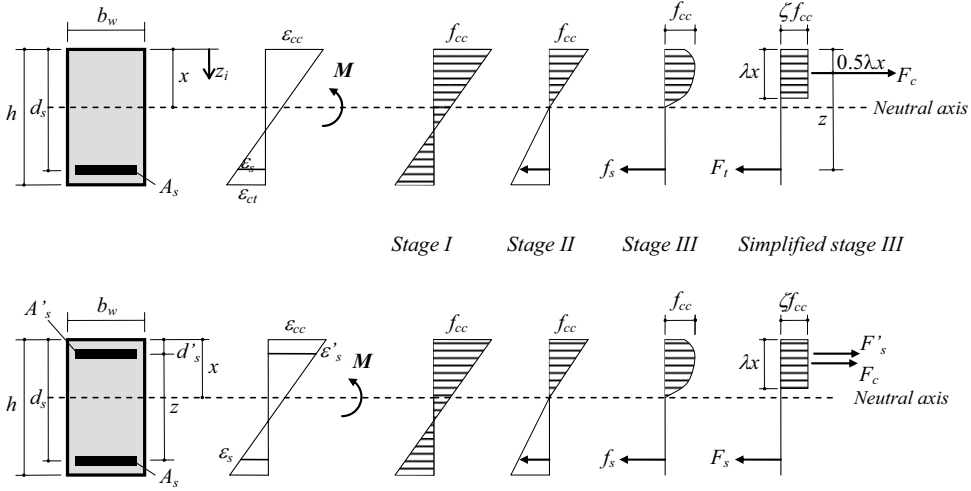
Different stages for reinforced concrete beams with rectangular cross sections, single and double reinforced.
